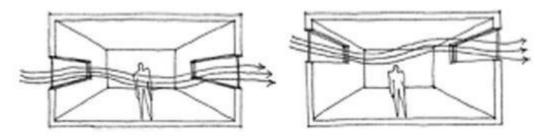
Potential positioning of windows in the facade for natural ventilation (Sayigh, 2014)
